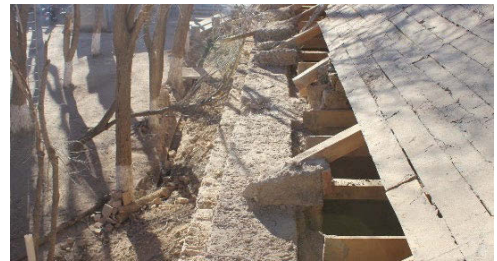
Detail of the reinforced concrete beam incorporated into the adobe walls in Casa del Marques © Authors
